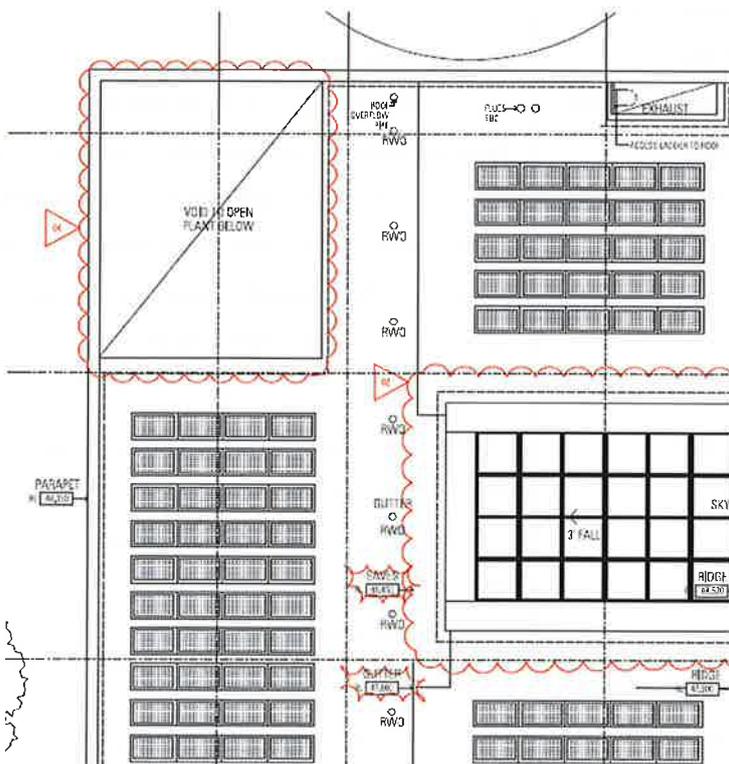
ROOF PLAN (NORTH WEST CORNER) WITH THE REMOVAL OF HORIZONTAL ROOFTOP LOUVRES AS PROPOSED AS PART OF THIS REF
